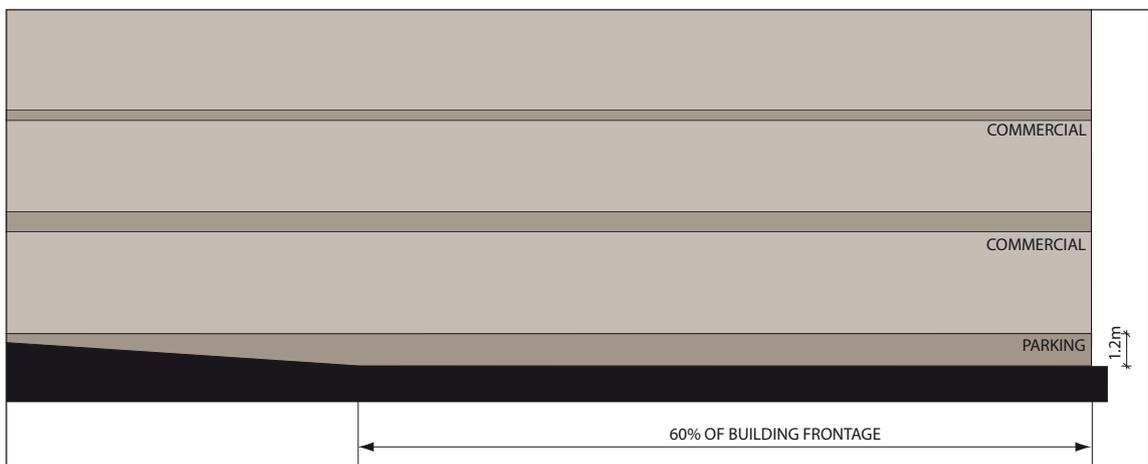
Along public streets, basement parking must protrude no more than 1.2 m above ground for no more than 60% of the building frontage
